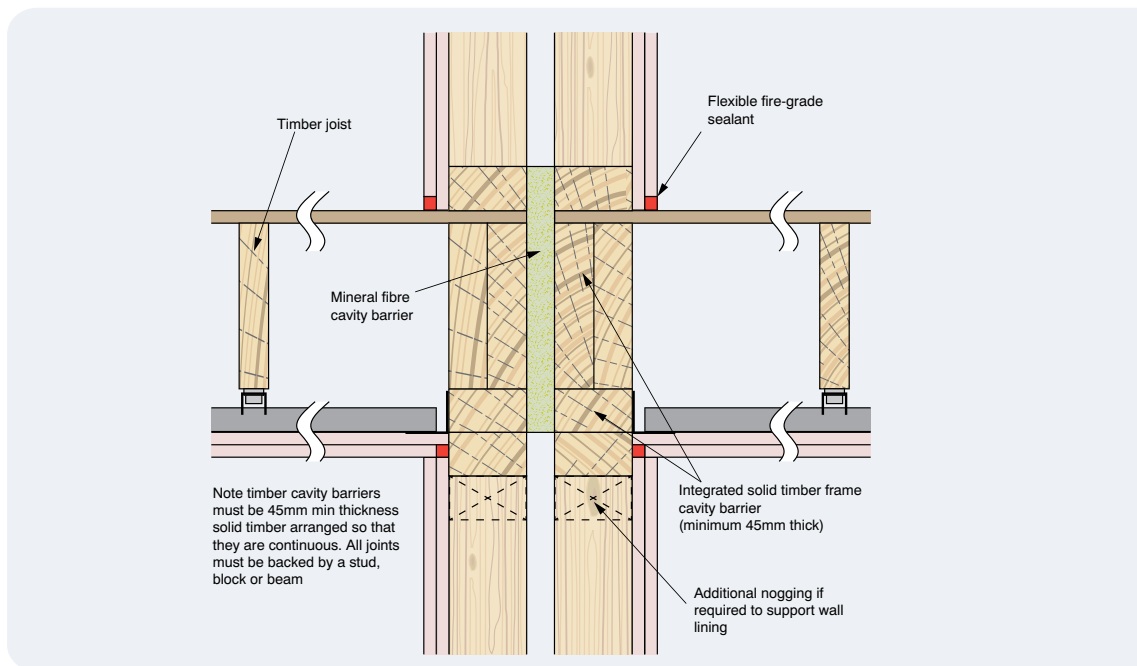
Fire-protected timber frame wall/floor junction with integral cavity barriers – beams parallel to wall Class 2 building.
